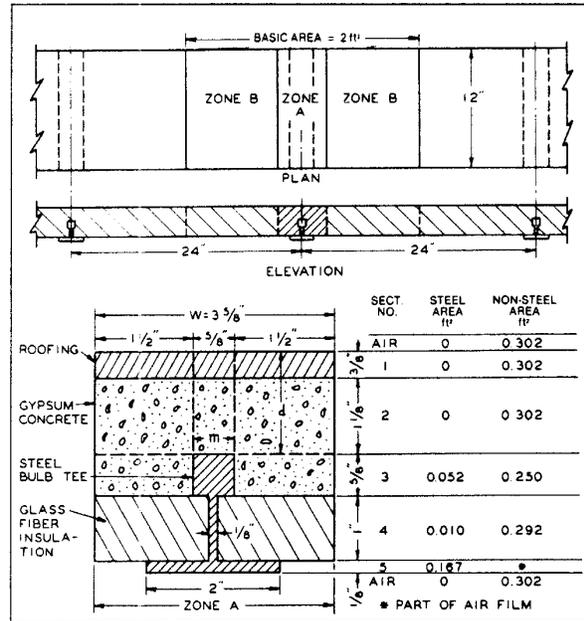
Gypsum Roof Deck on Bulb Tees (Example 4)
